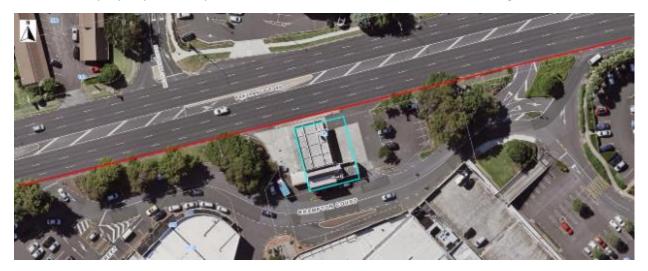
Pakuranga Rd longitudinal drainage works and GAS service station (blue outline)
